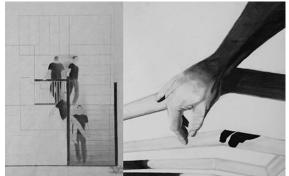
$1/4'' = 1' \cdot 0''$ drawing combining section and plan; full-scale drawing of hand in a local space.
